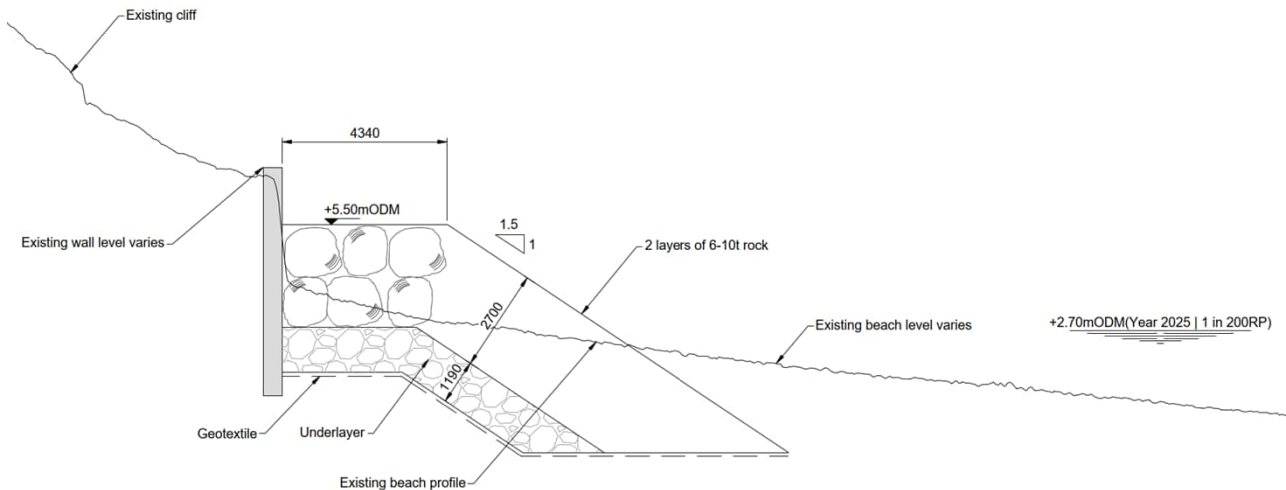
Typical cross section of proposed works at Whiterock and North Killiney (B2 & B4)
